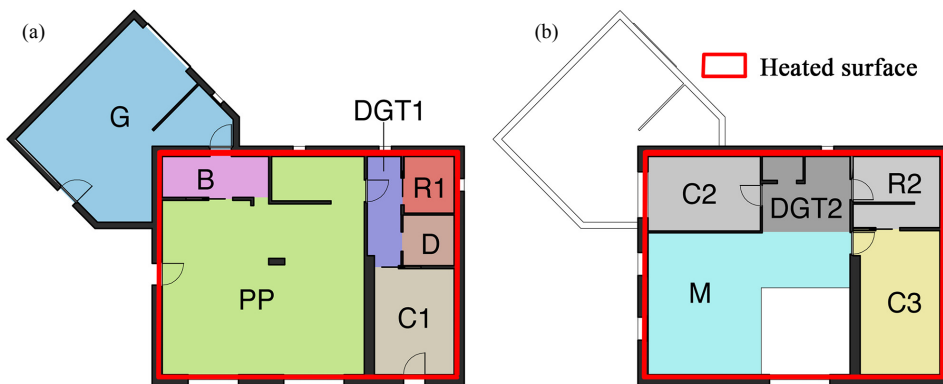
Plans of the CSB with defined thermal zones. (a) Ground floor. (b) Second floor.
